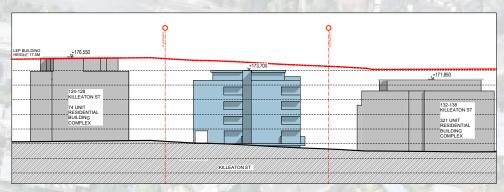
Concept North Elevation (STREET VIEW) Source: Mackenzie Architects International
